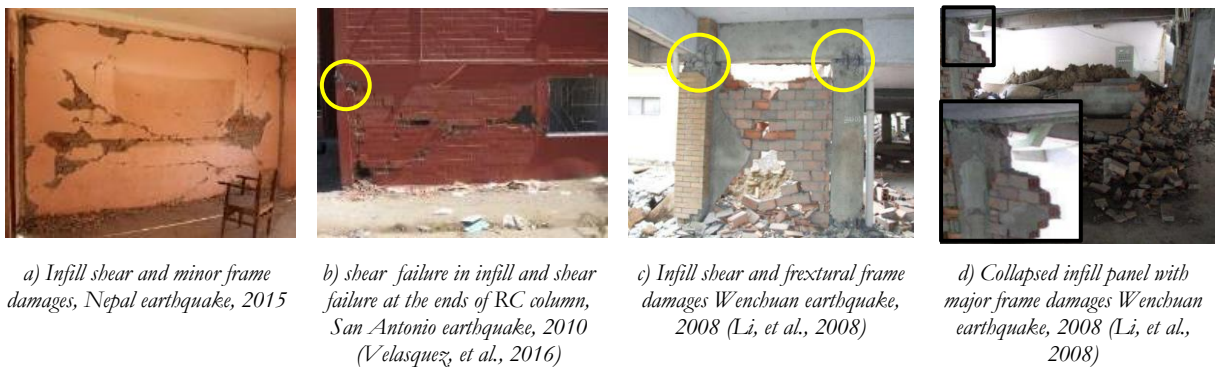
Damage pattern of masonry infills and RC frames; which varies from minor cracks to major failure
